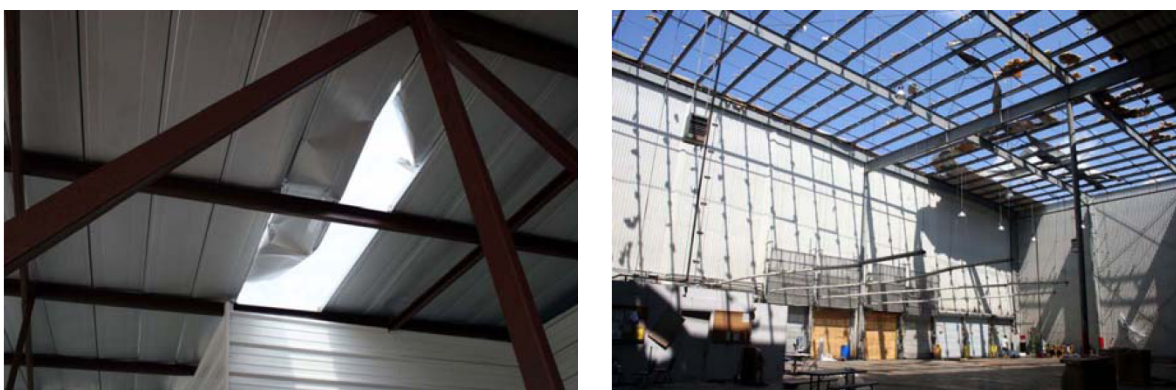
Metal building roof failures caused by internal wind pressure (RICOWI 2009)
